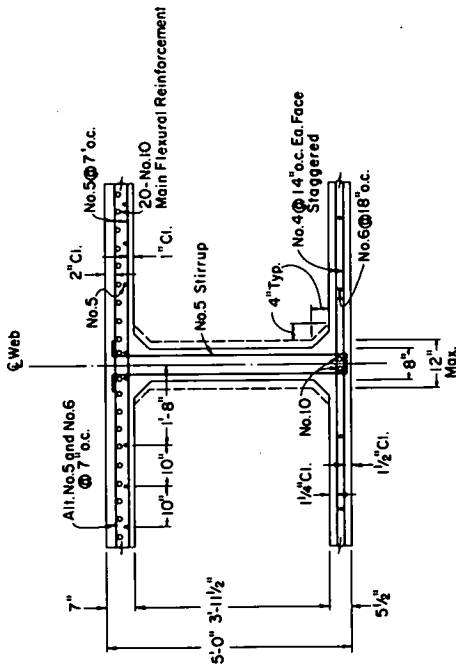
Cross Section of Typical Interior Girder of Bridge at Face of Bent Cap
